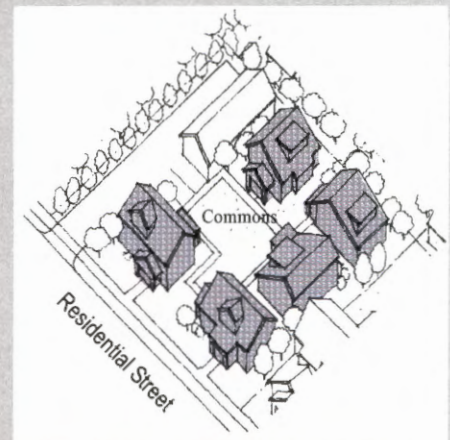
Cottage housing example. Note arrangement with central commons, connecting walkways, porches orienting to street and commons, varied roof forms, and parking off to the side.
